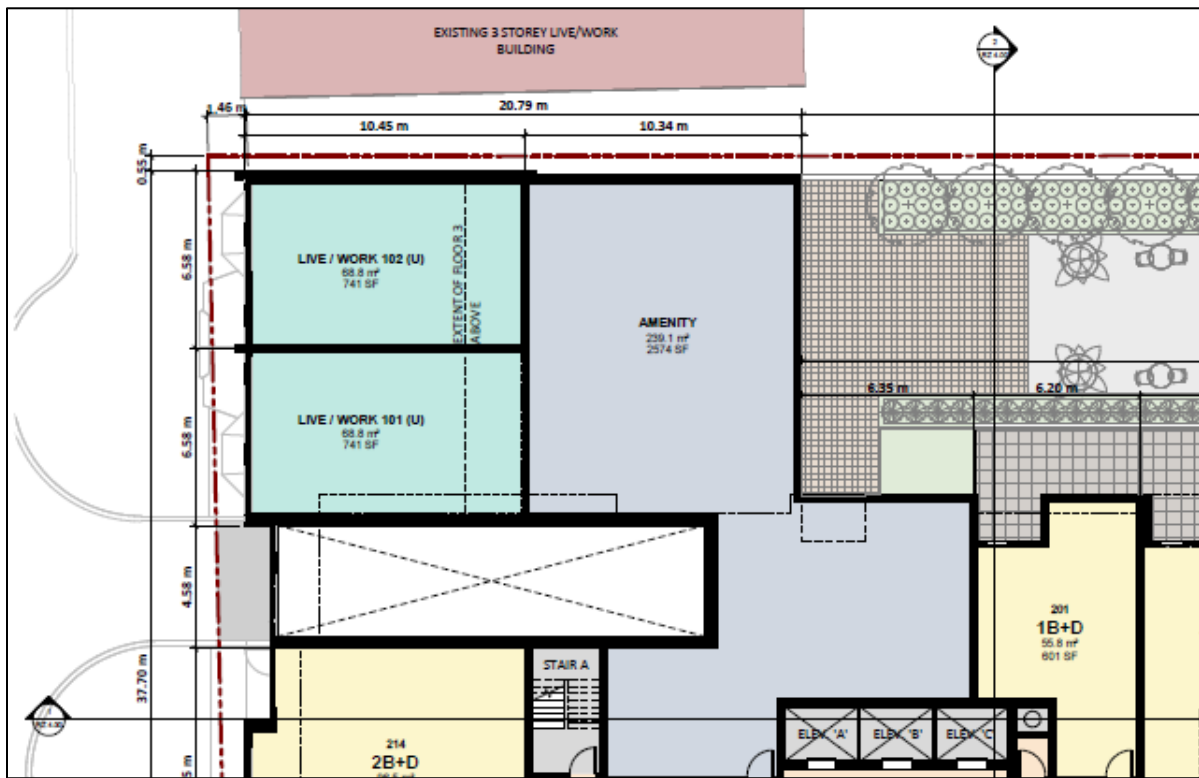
Excerpt from Floor Two plan (source: TurnerFleischer Architects)
